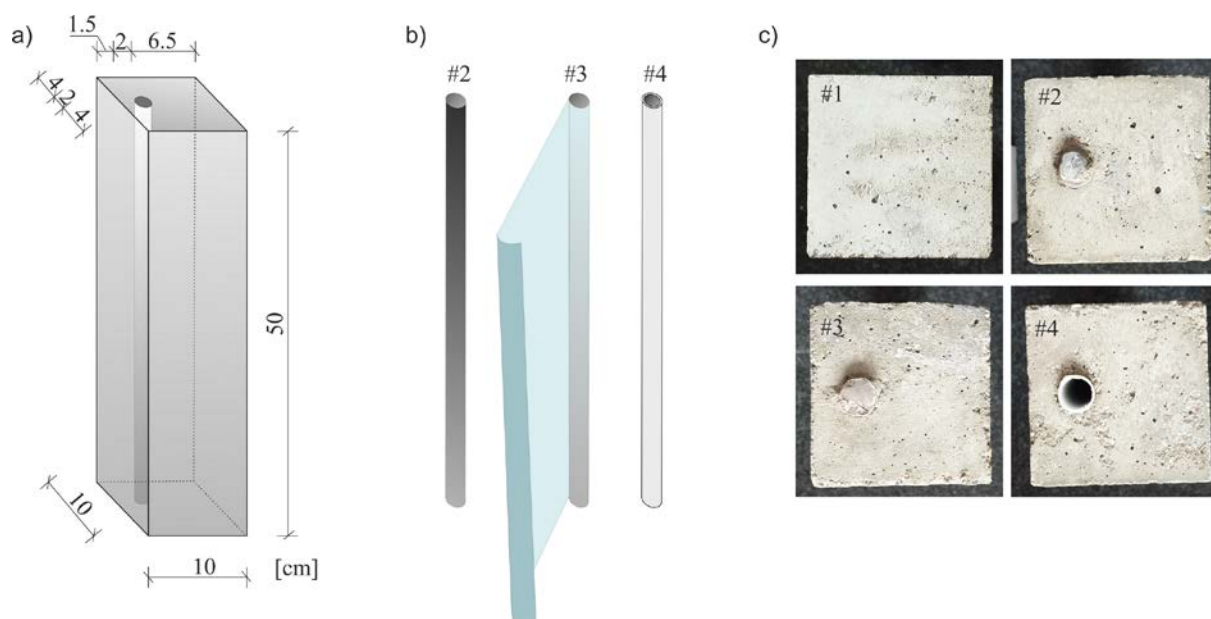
Geometry of tested beams: a) 3D view with dimensions; b) types of inserts used to form inclusions (steel bar, steel bar wrapped with cellophane film and PVC pipe); c) plane views of specimens #1 to #4
